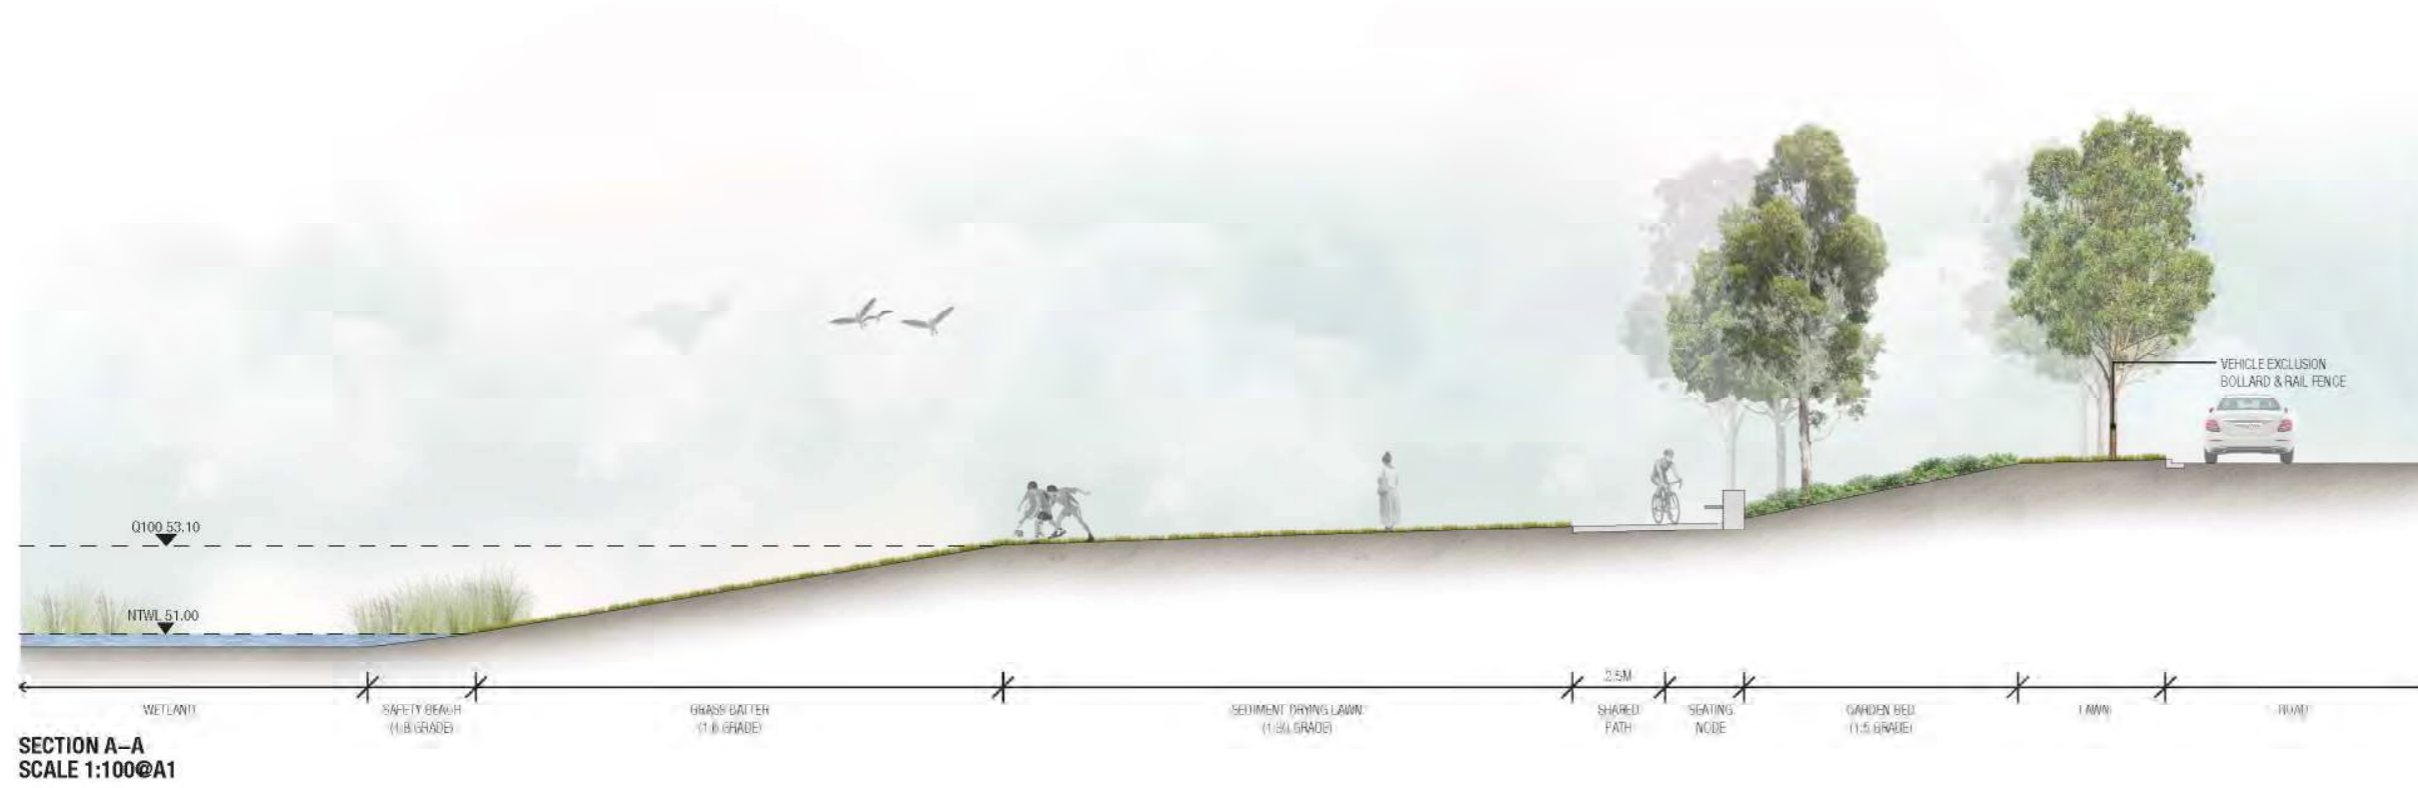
Revised Wetland/Waterway landscape concept - Sections (MDG Landscape Architects, 05.04.2024)
